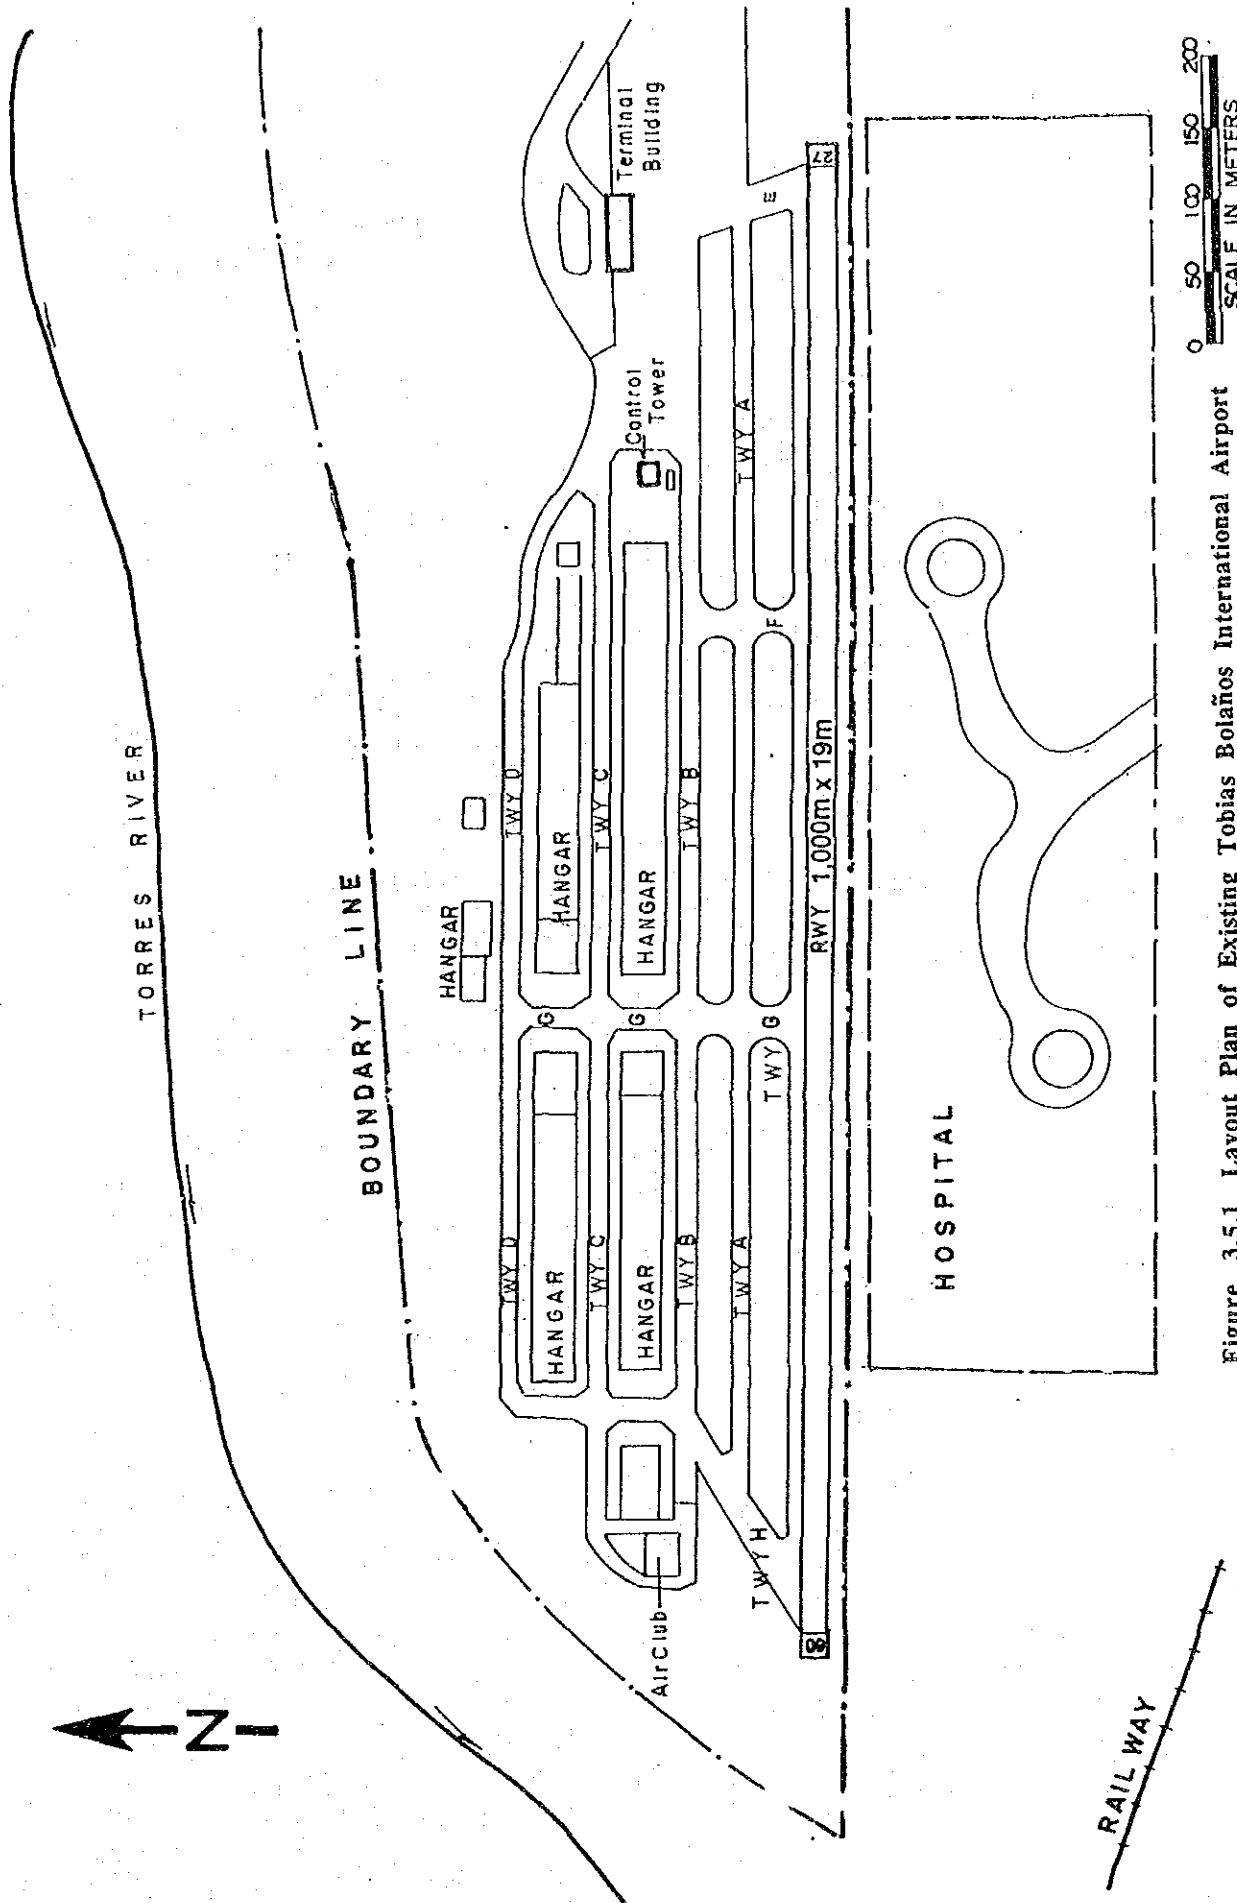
Layout Plan of Existing Tobias Bolaños International Airport
